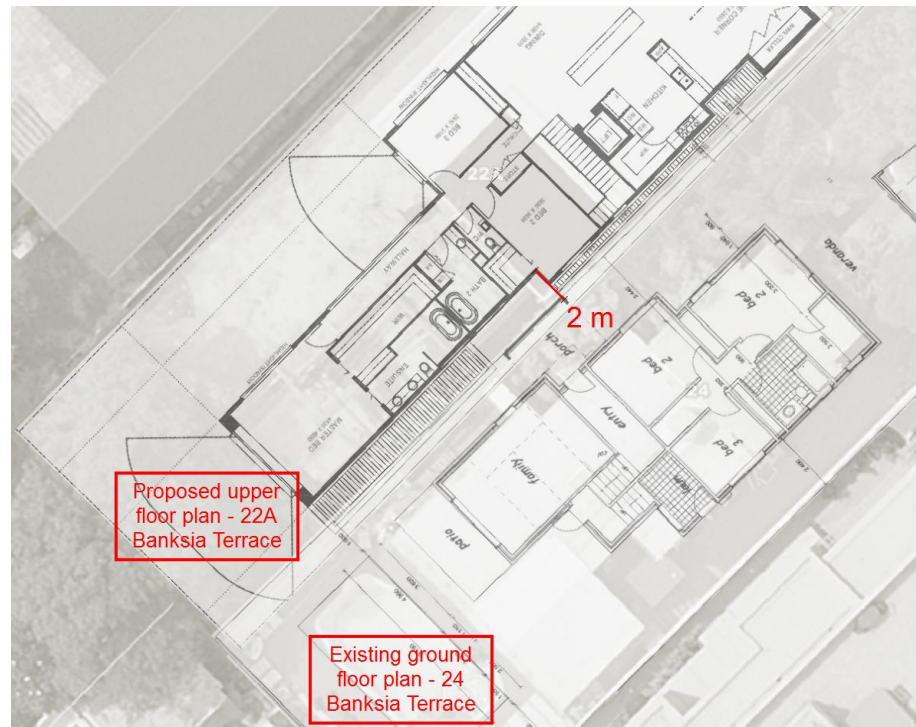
Overlay image of upper floor plan at 22A Banksia Terrace and existing ground floor plan at 24 Banksia Terrace. Please note this overlay image is an approximation and should only be used for guidance purposes.
